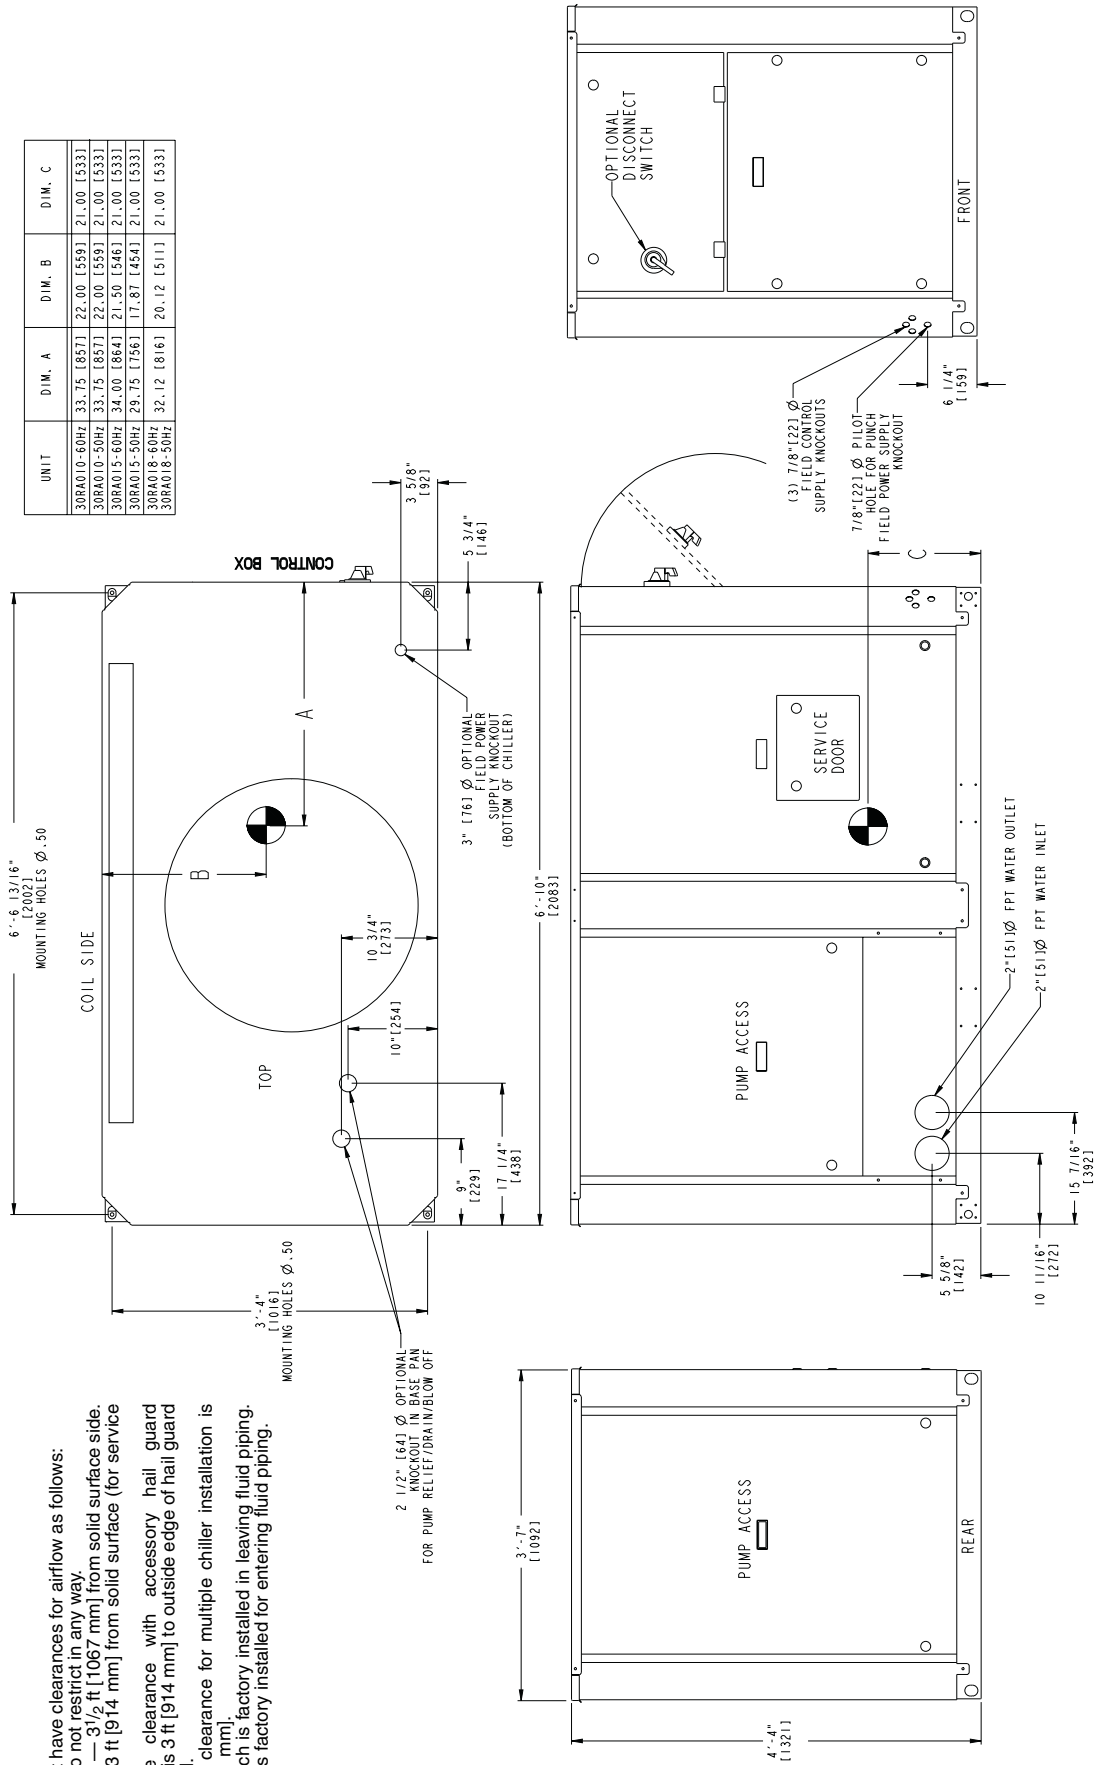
Dimensions — 30RA010,015,018 AquaSnap™ Chiller
